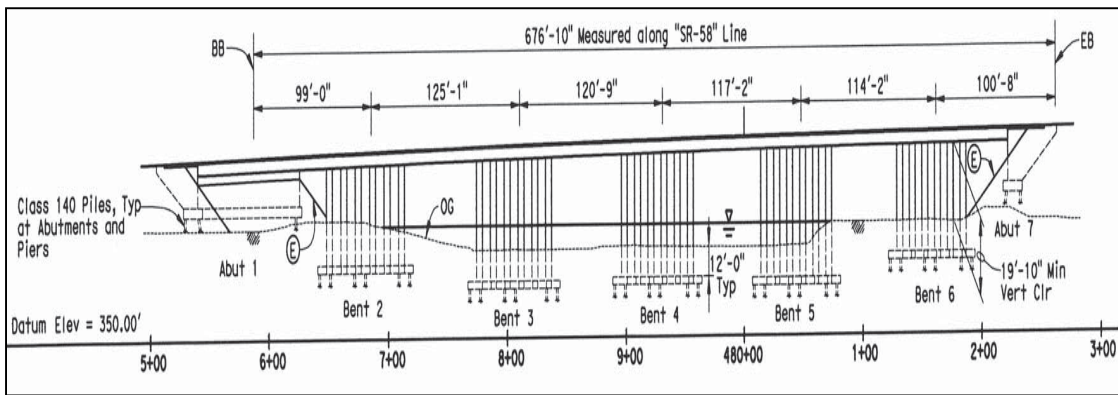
Profile of Bridge Widening over the Kern River (Alternative B)
